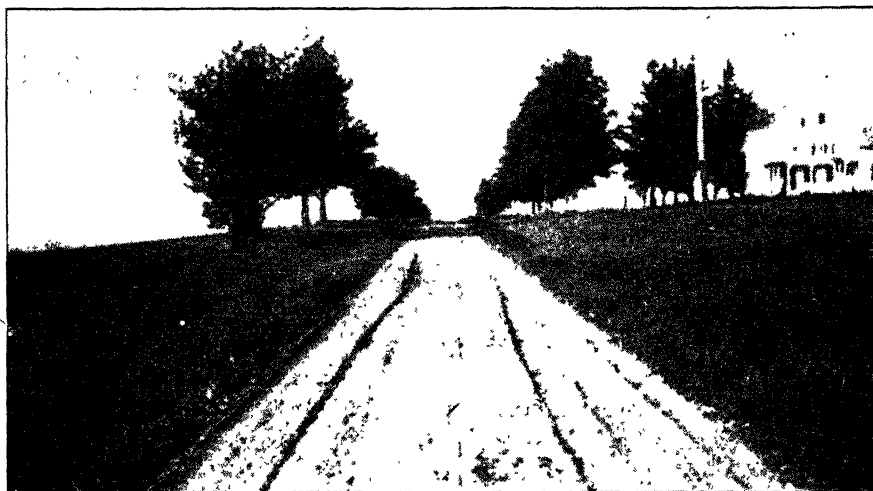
WHERE ROAD FENCES ARE UNNECESSARY THEIR REMOVAL PERMITS FARMING TO THE ROAD DITCH
